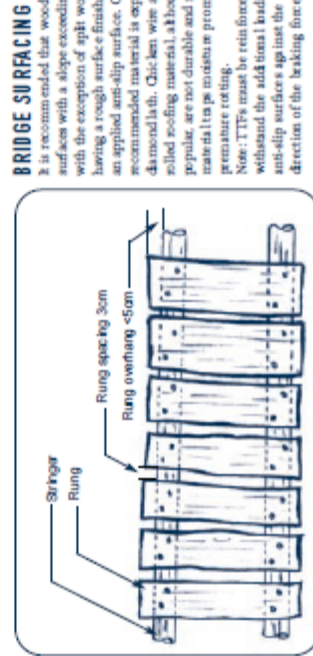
BRIDGE RUNG SPACING, RUNG OVERHANG
